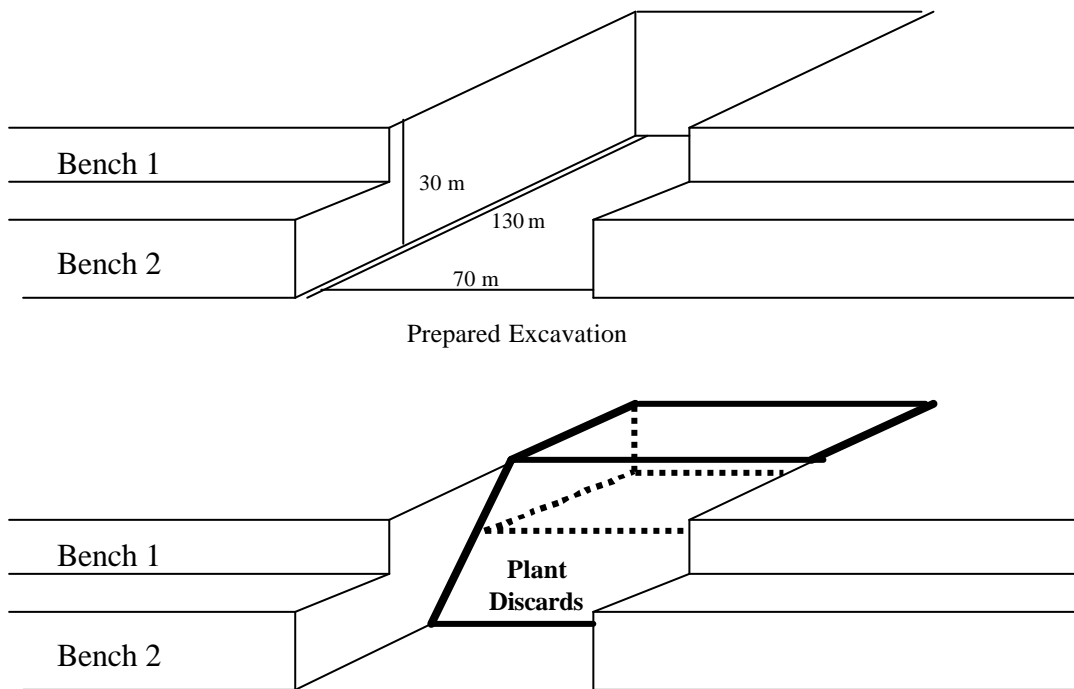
Test performed in 1988 in a prepared excavation within the pit of Grootegeluk
